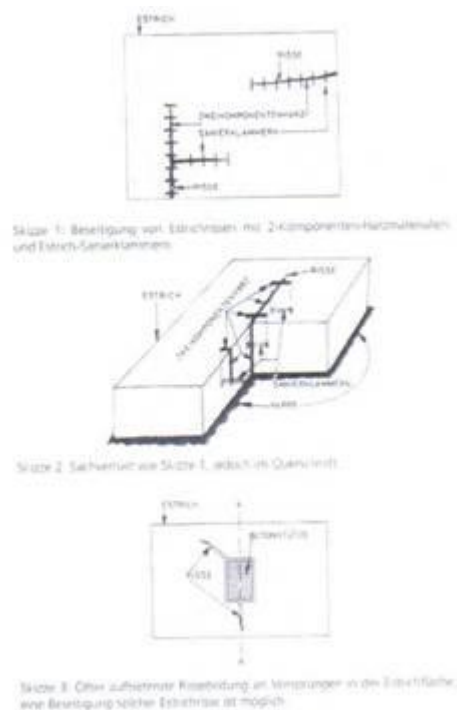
Crack repair (Source: Rosenbaum/Kaulen/Hahn, Erläuterungen zur DIN 18365, Bauverlag GmbH, Wiesbaden 1989)
